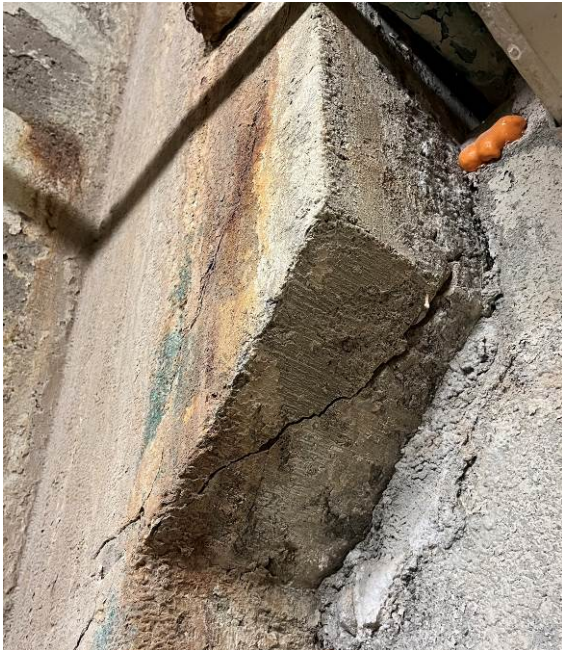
Vertical crack in column propagating through geometry change.
